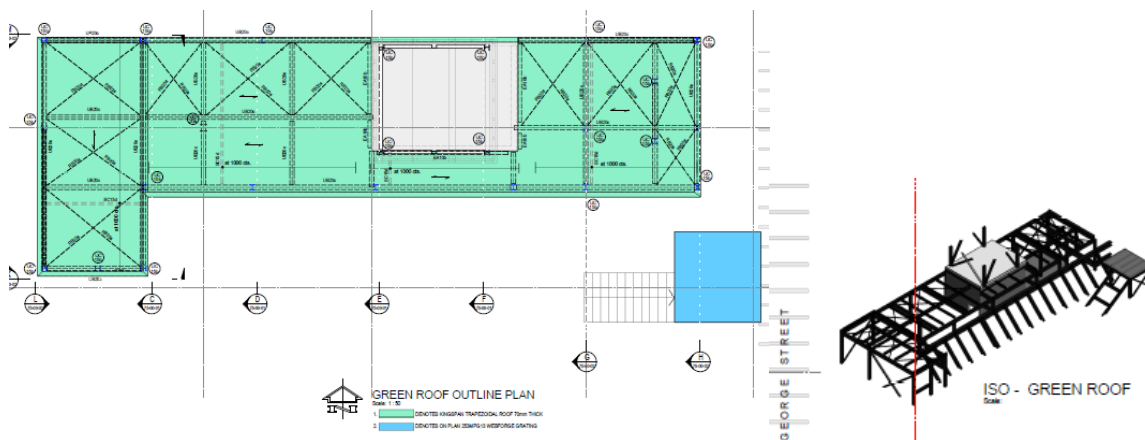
Proposed green roof outline plan, steel frame location. The blue shaded area is the proposed new viewing platform. (Source: TTW, drawing number ST-285- 60-00-65, November 2018)
